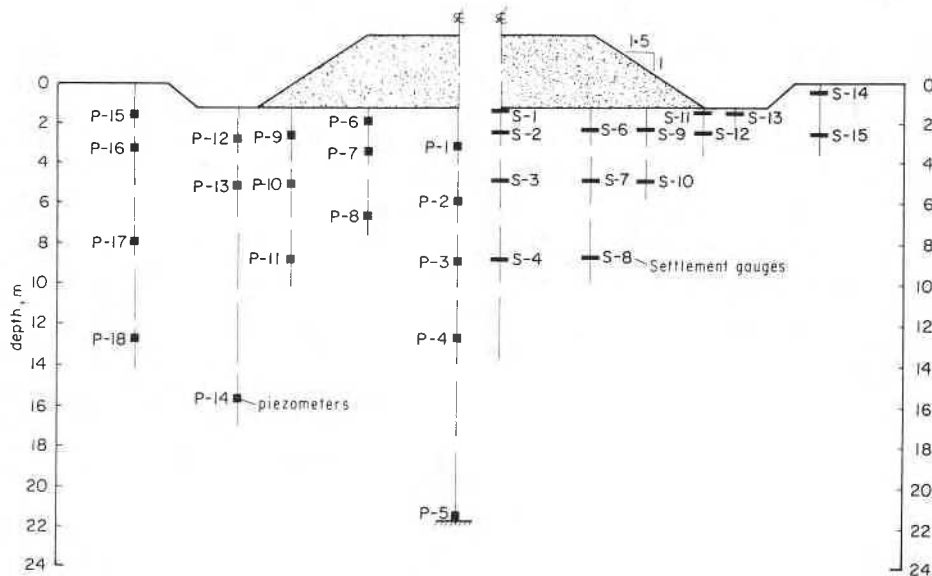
Location of settlement gauges and piezometers—Gloucester test embankment.
